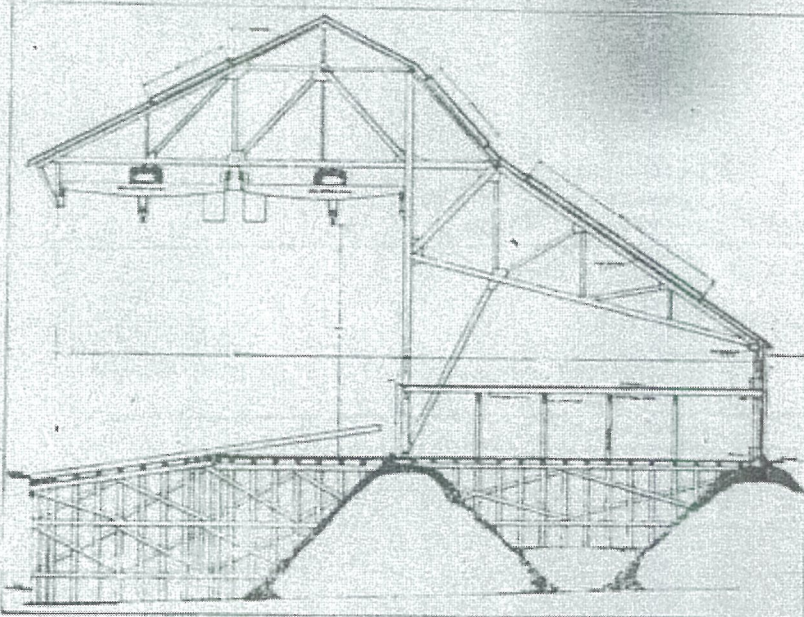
Cross Section of Ship Shed, Prince Rupert.
